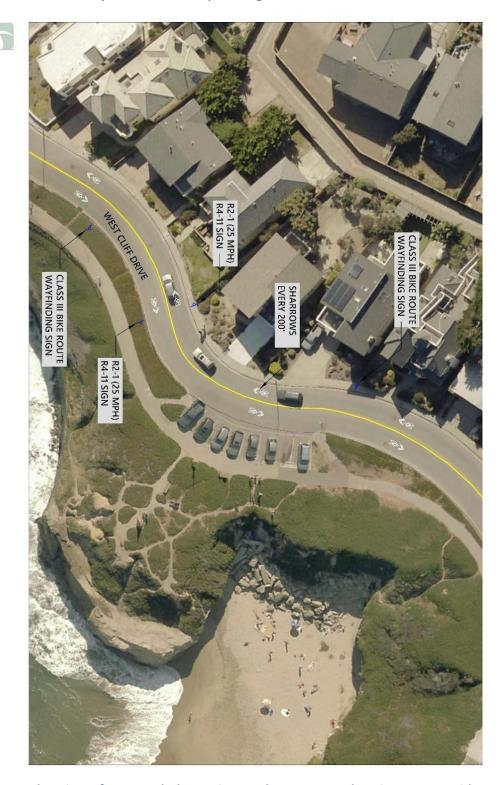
Plan view of Proposed Alternative 1 Enhancements Plan view at Pyramid Beach parking lot
